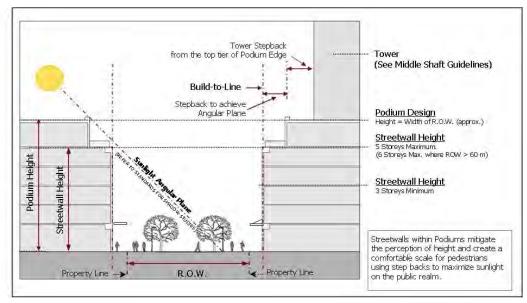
Podiums and their streetwalls will be designed with stepbacks at the upper storeys to provide light filled sidewalks and boulevards in the Downtown Core.
